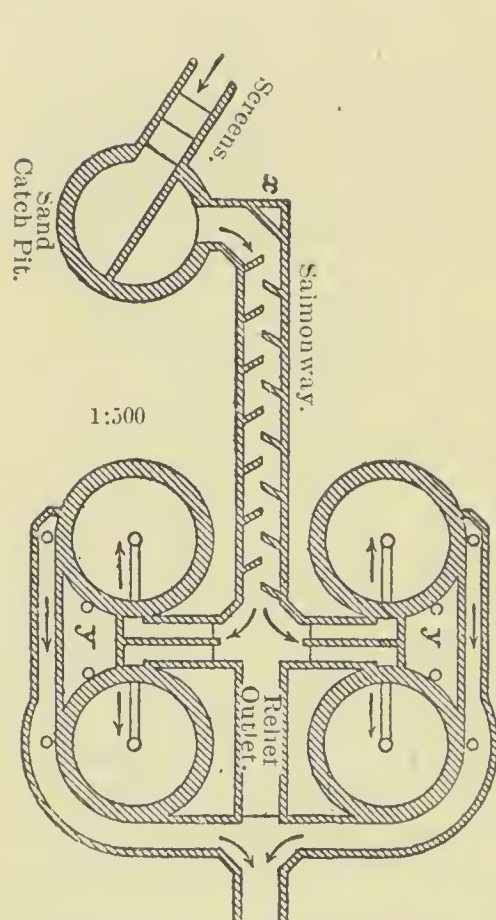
PLAN OF PURIFICATION WORKS AT ESSEN.
